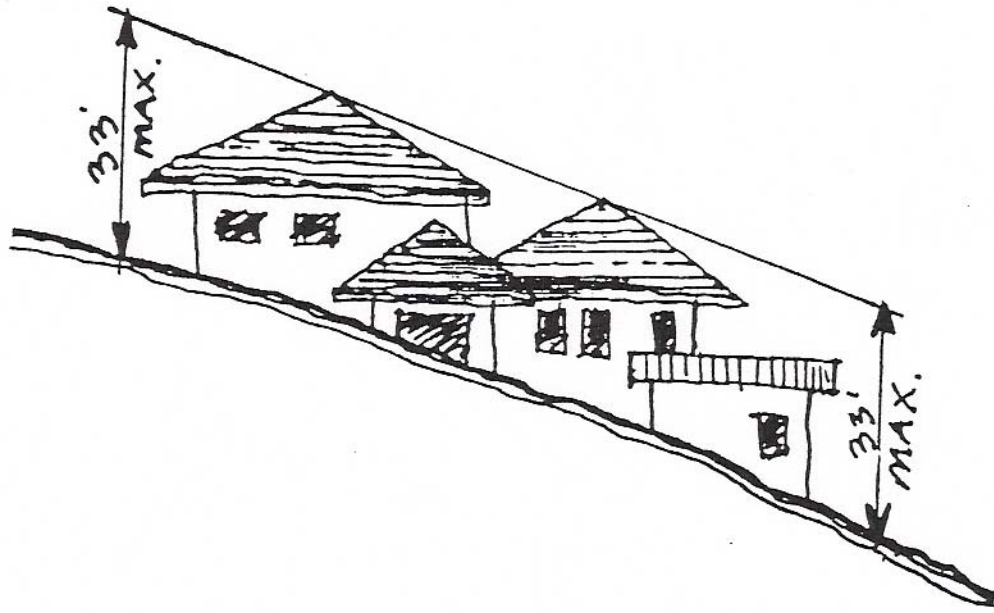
Building height regulations encourage buildings to follow the natural slope of a lot.
